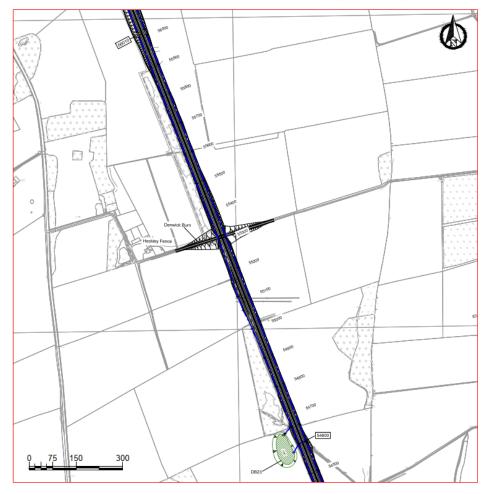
Highway Drainage Layout and Detention Basin DB23 PRELIMINARY DESIGN STRATEGY:
